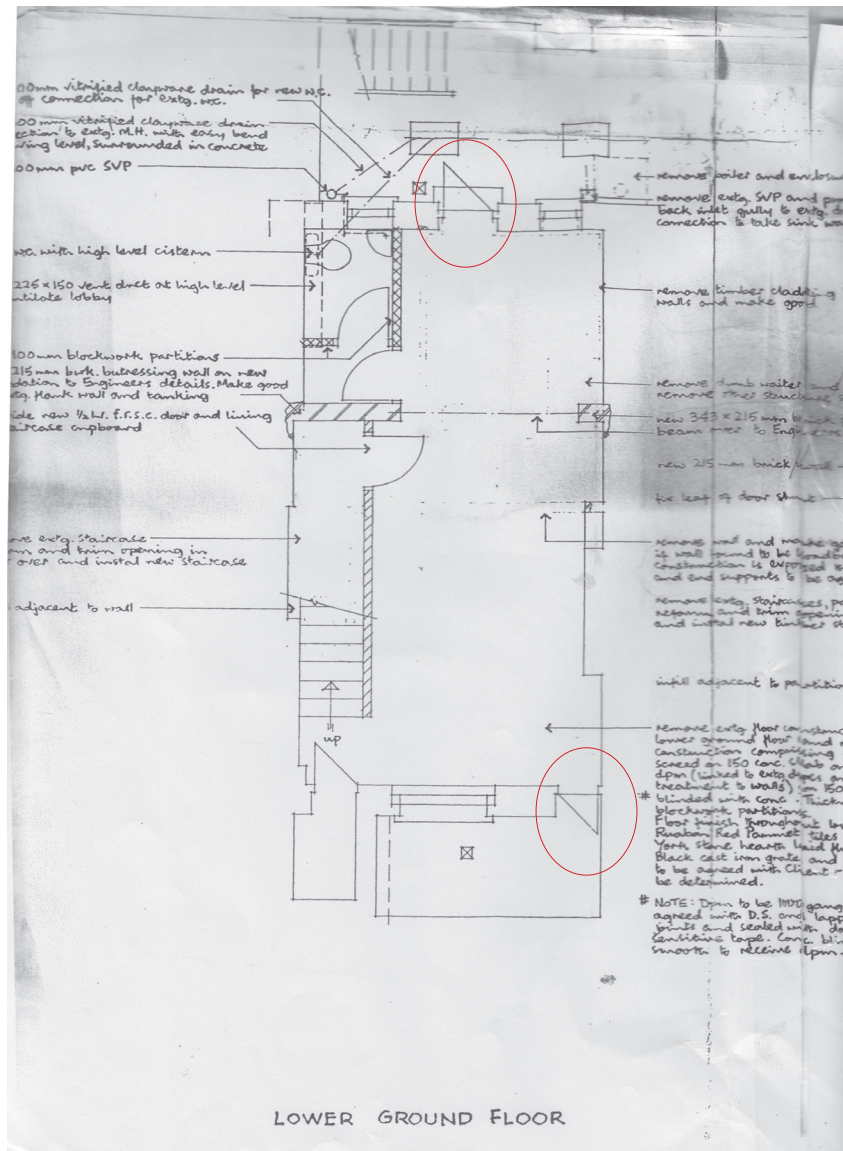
Extract from drawing of lower ground floor plan indicating 1985 works to the property. This archive drawing indicates the former position of the door accessing the lightwell, which we are seeking to investigate with Graeme Metcalf. Note: originals of the archive drawings are not available
